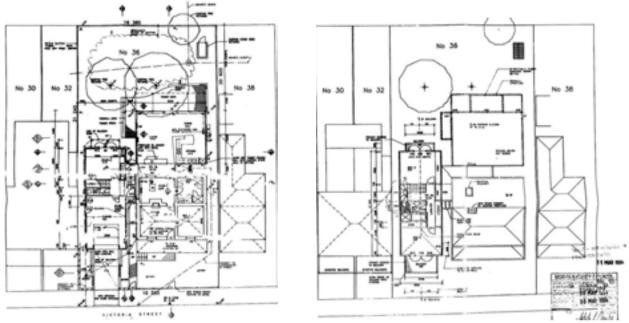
(Left): Approved Site/Ground Floor Plan DA1131/93/2 Figure 39 (Right): Approved First Floor Plan DA1131/93/2
